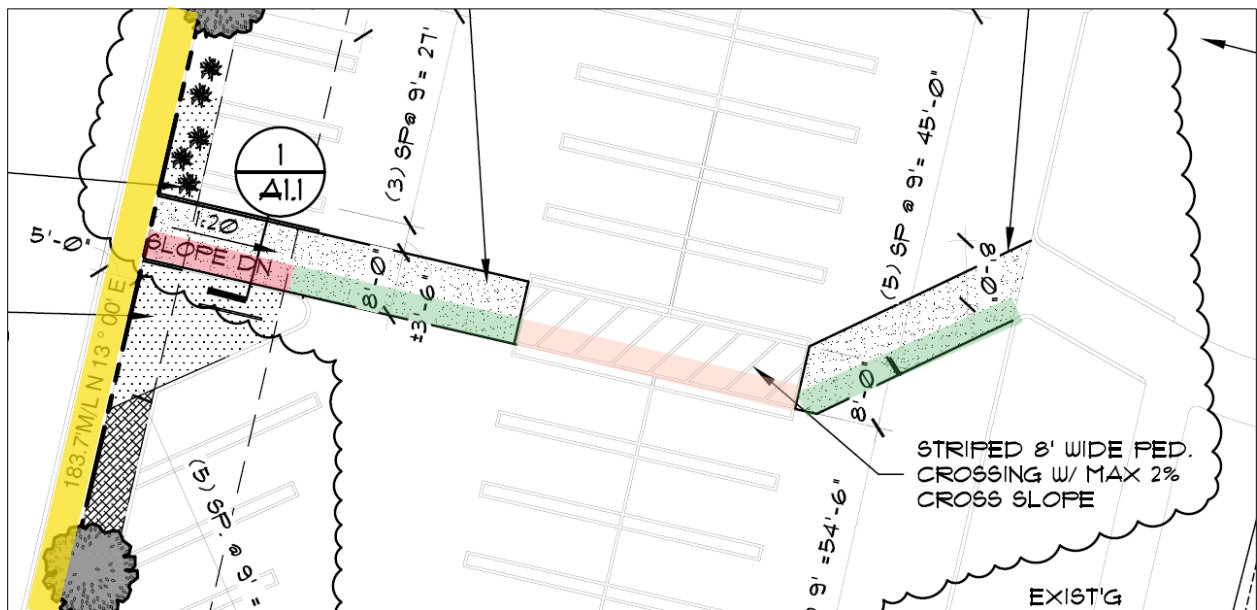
Exhibit A. Site Plan Sheet A1.1. Dated 5/7/24
